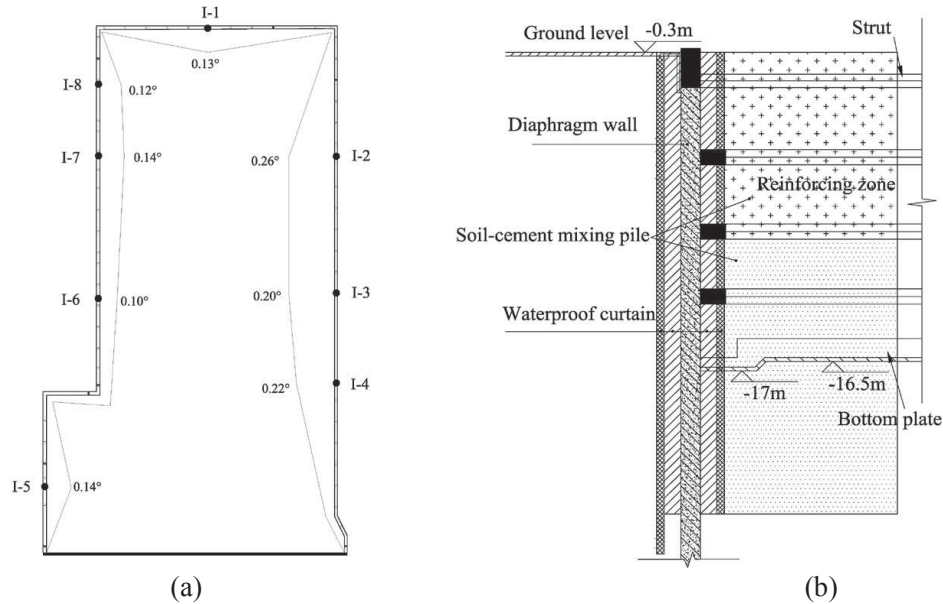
(a) Planar inclination profile of diaphragm wall (b) Reinforcement at west wall
